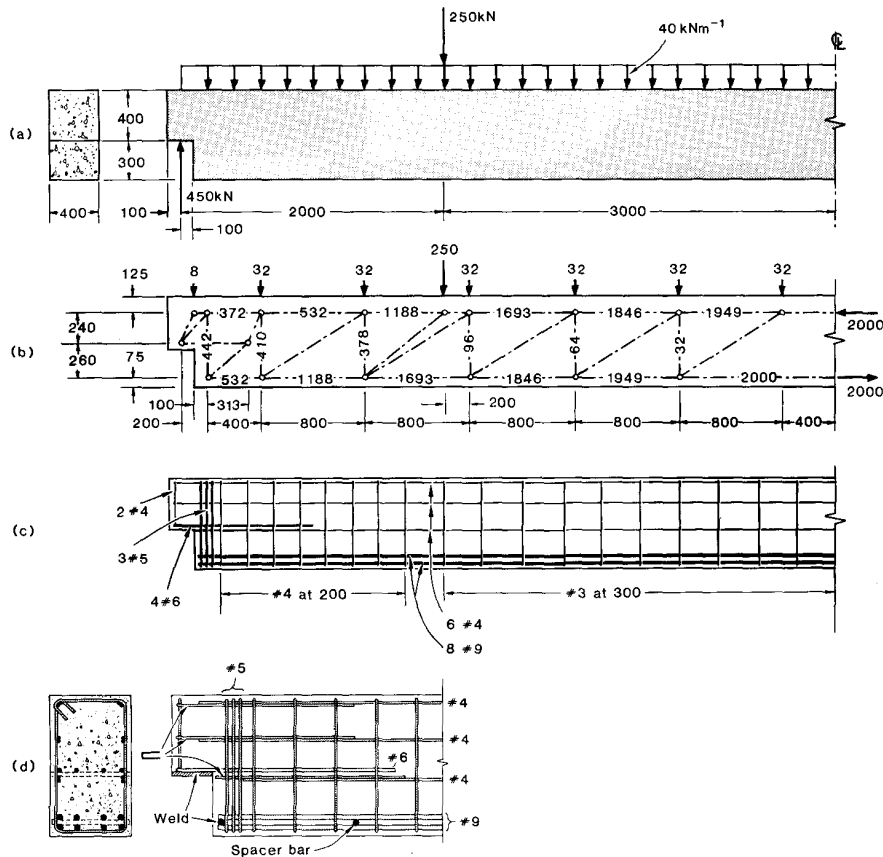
Design example 2: (a) Geometry and loading (1000 mm = 39.4 in., 1 kN = 0.225 kip); (b) Truss model; (c) Reinforcement; (d) Detail of draped end
